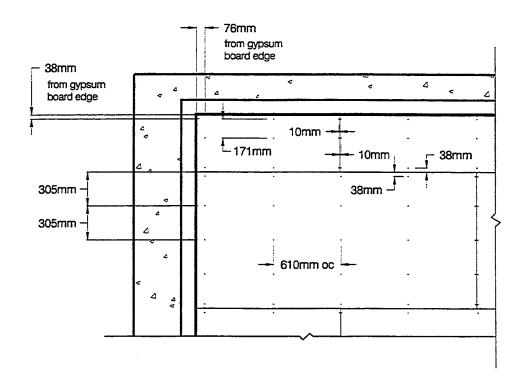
Screw patterns for single layer of gypsum board with resilient metal channels 610 mm o.c.
